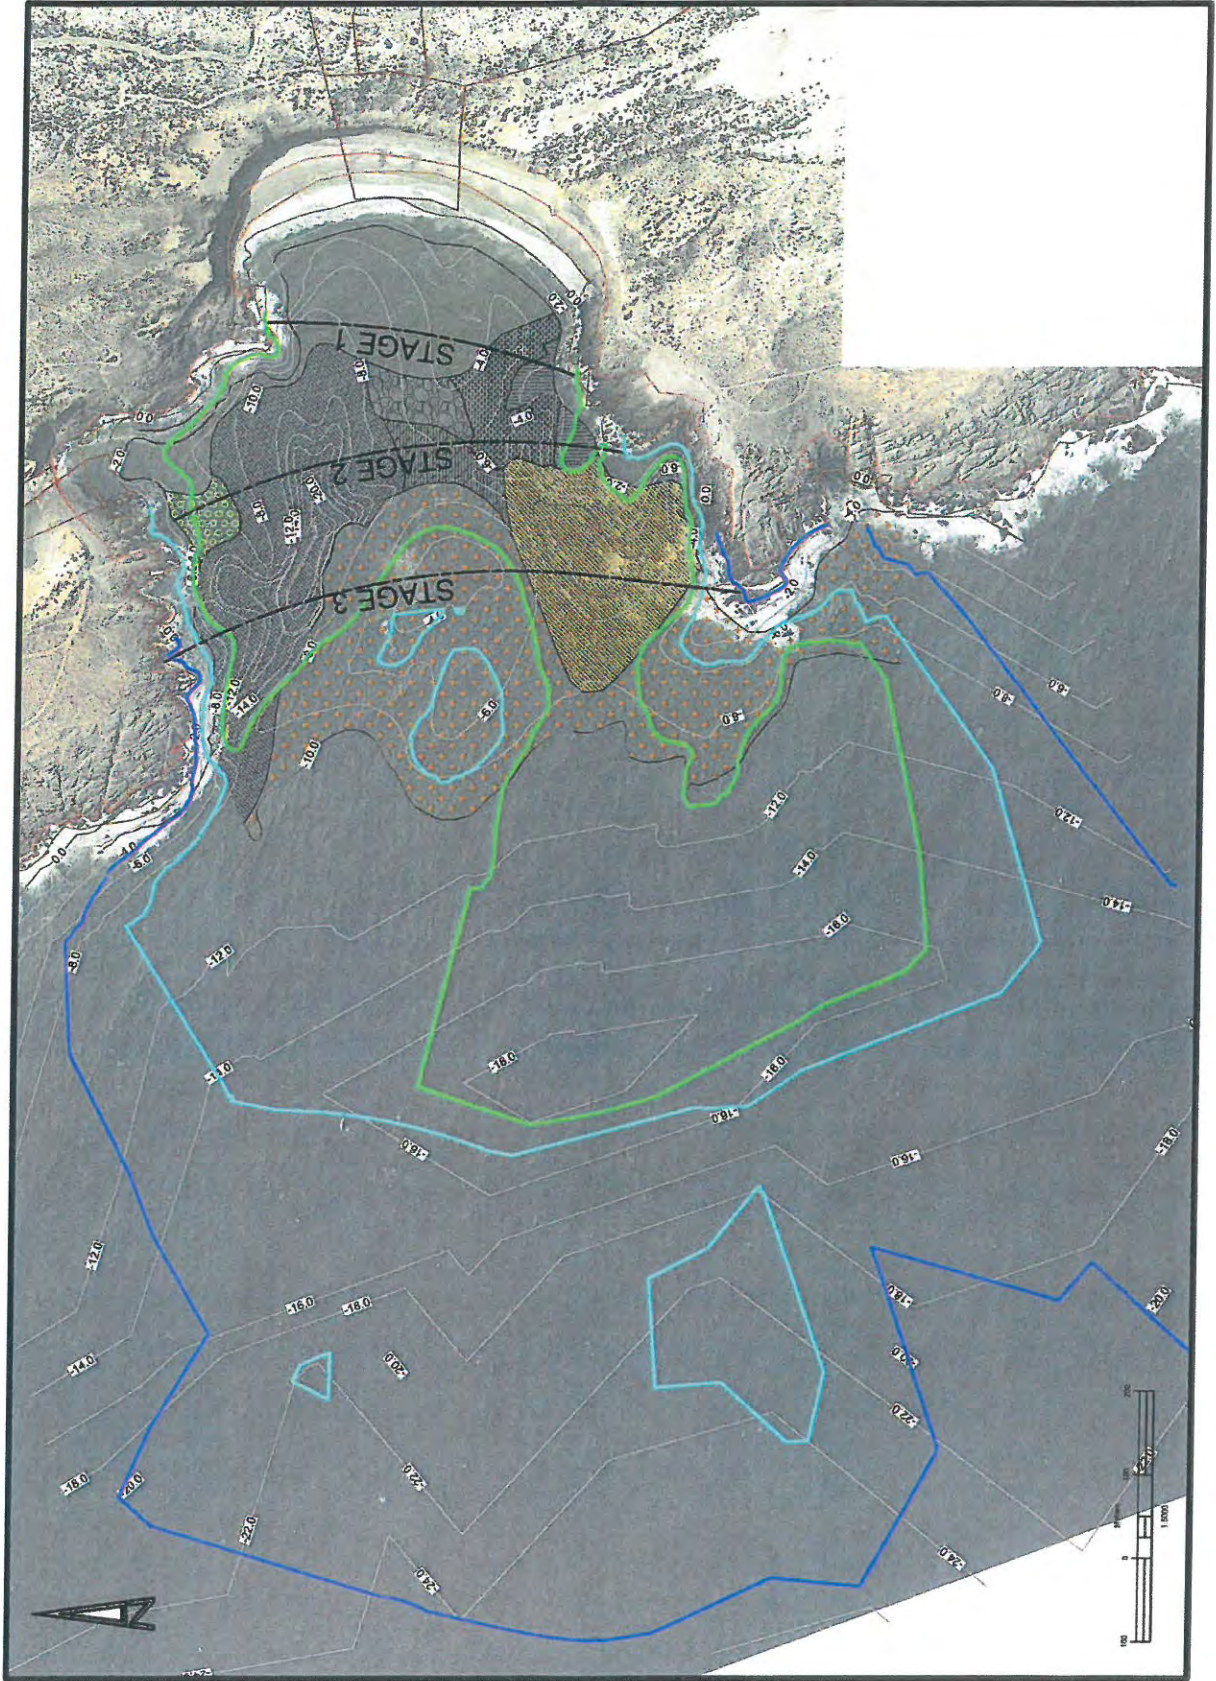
Illustration of dynamically stable rock berm construction to access offshore
